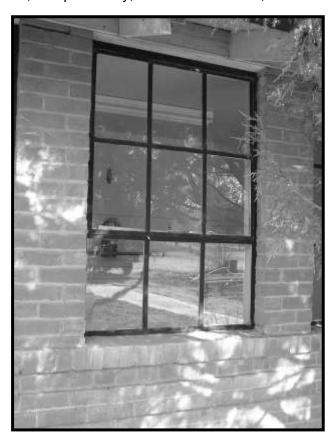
Hall window, west façade, looking southeast. The upper two rows of lights are operable as a
